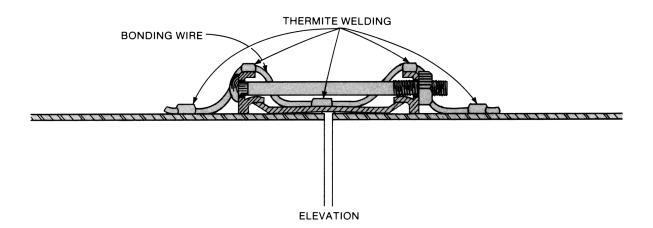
Bonding jumpers installed on sleeve-type coupling
